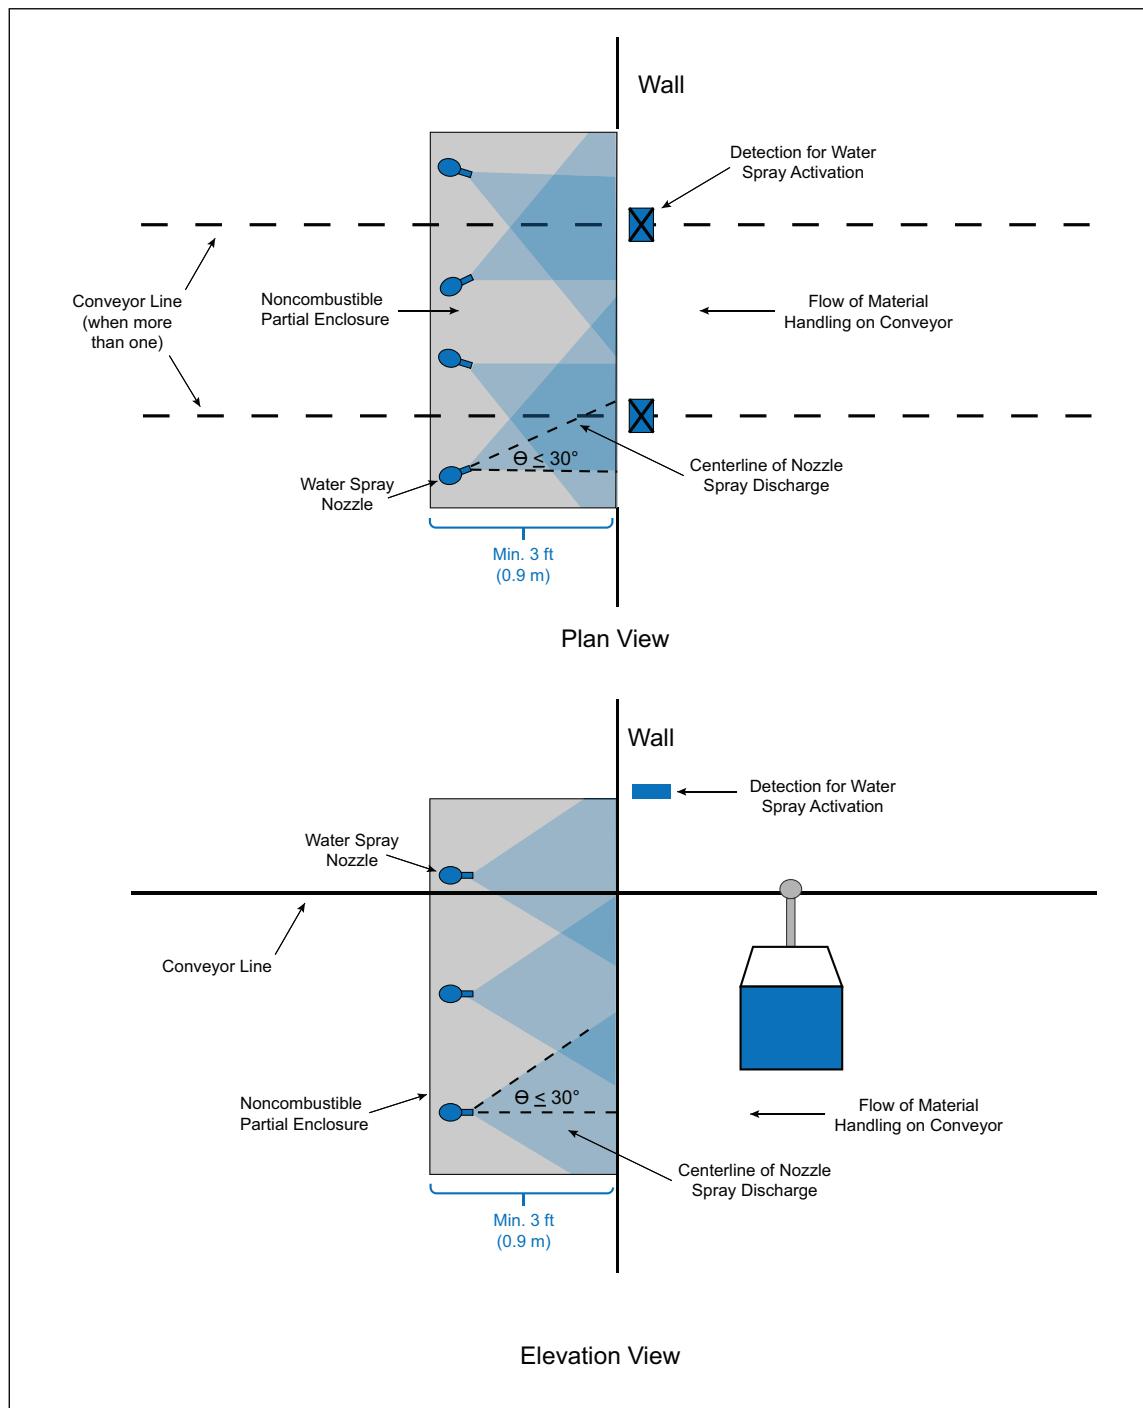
Protection of conveyor opening in a wall with flow of material handling through the opening only in one direction
